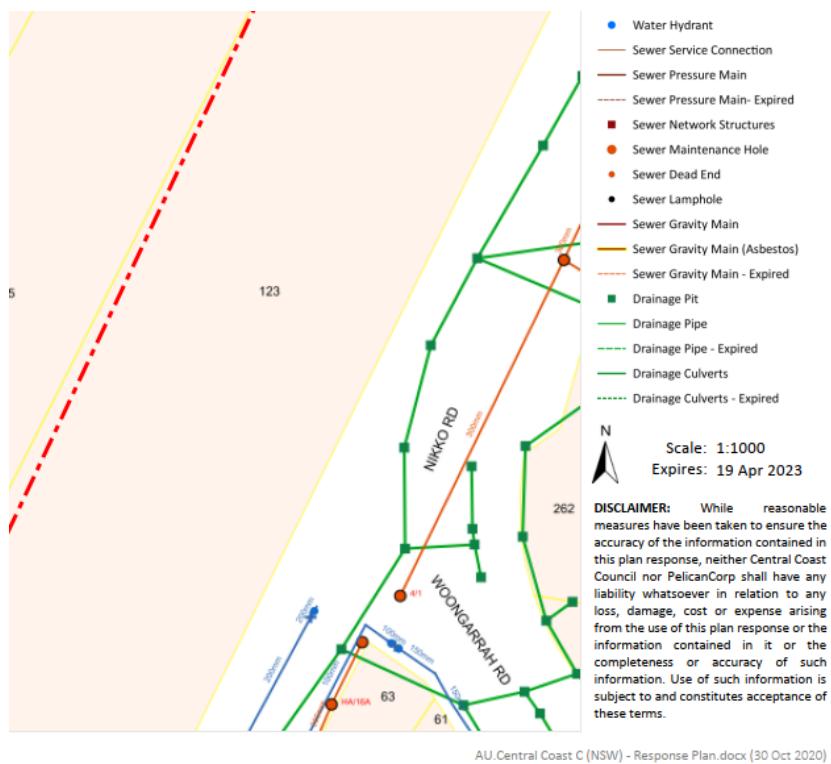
Sewer connection point on Nikko Road for proposed Sewer Rising Main
